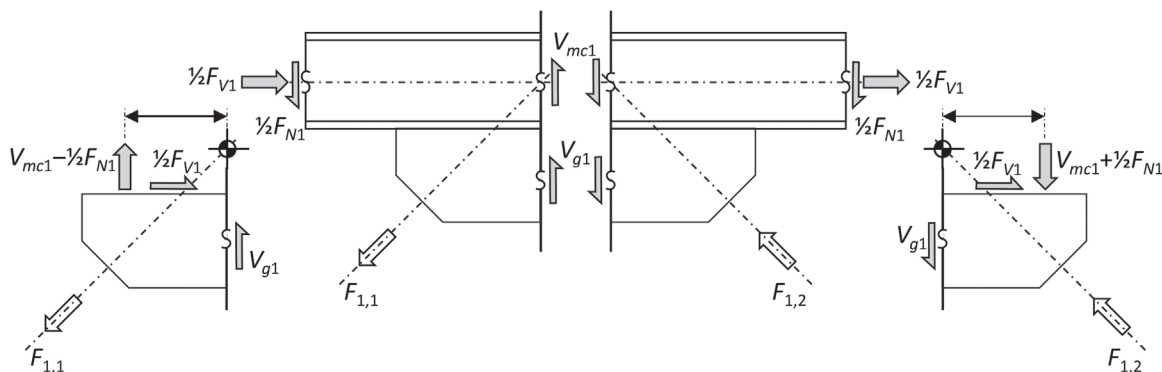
Transverse section of beam and gusset showing chevron shear.
